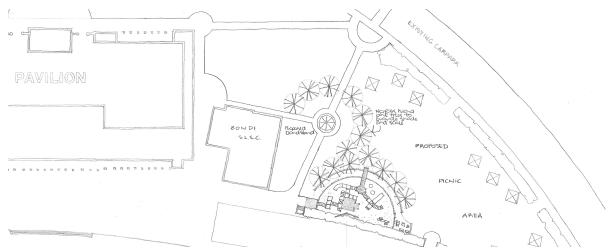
Extract of 1989 plan of the proposed playground which was built largely according to this plan. All the additional picnic shelters were not built nor the bandstand and arc of trees. Source: WC LSC Engineers plan 6576-01
